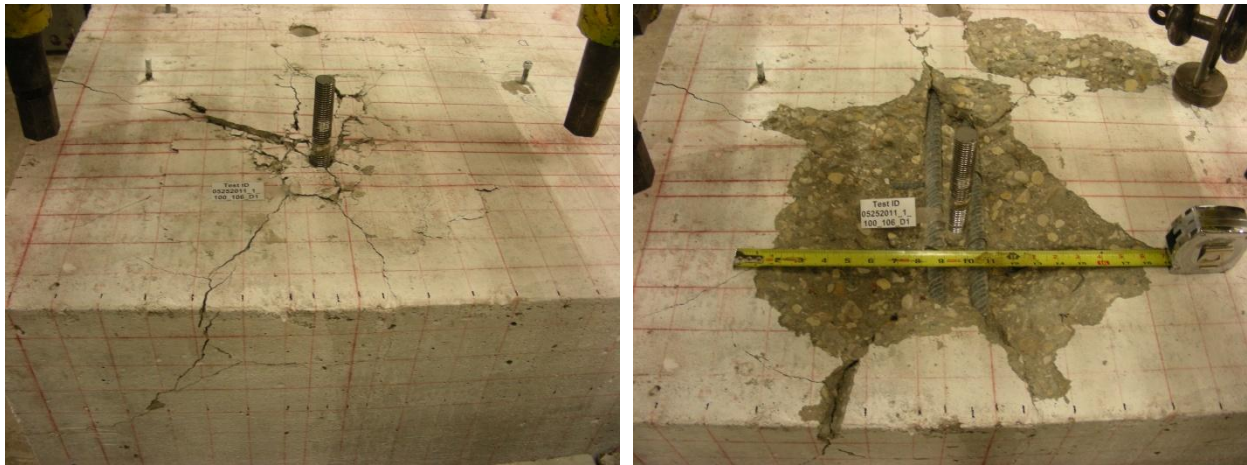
Failure of 1.0-in. anchors with Type D reinforcement under monotonic tension
